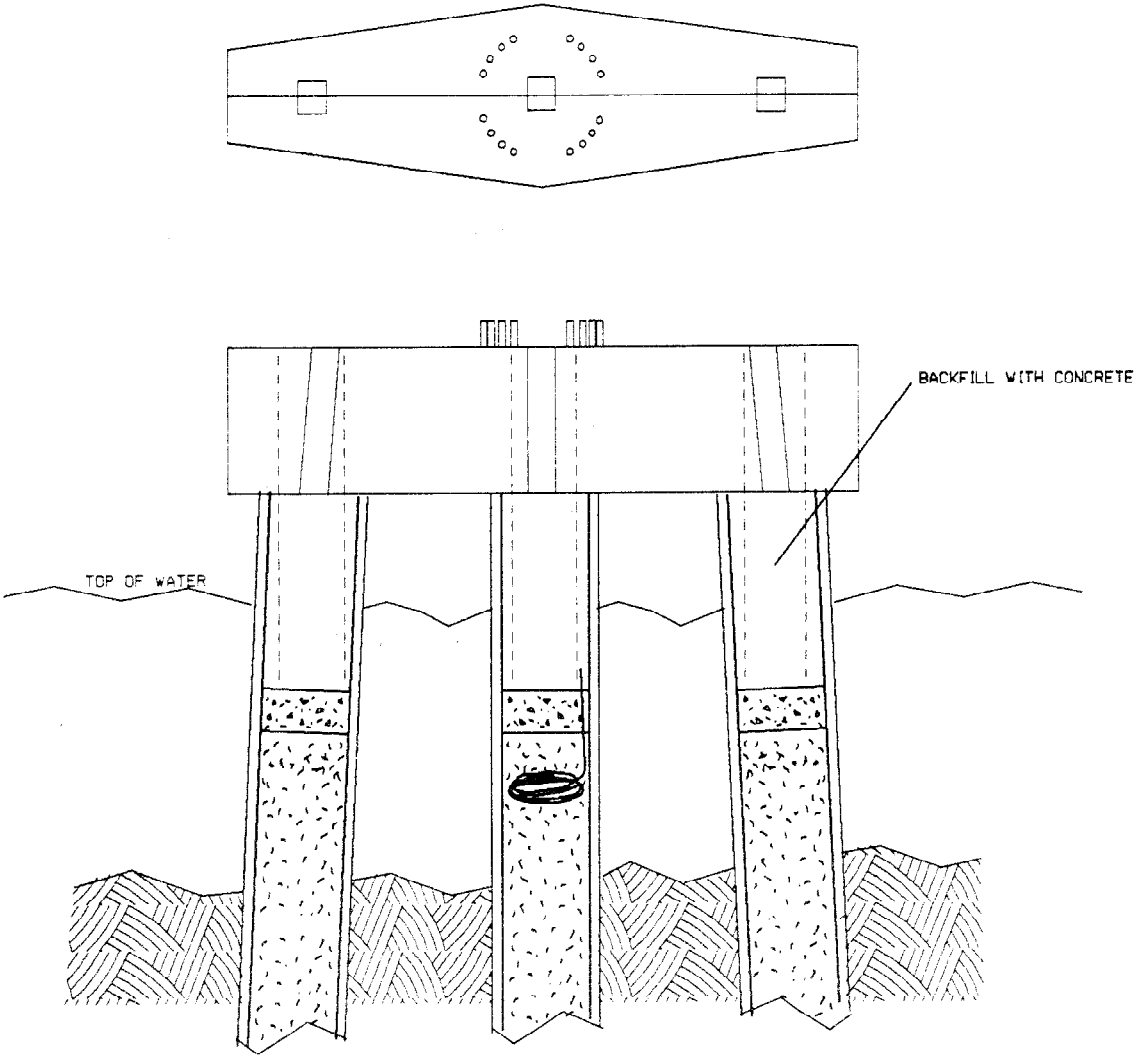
Precast Concrete Cylinder Pile Foundation
